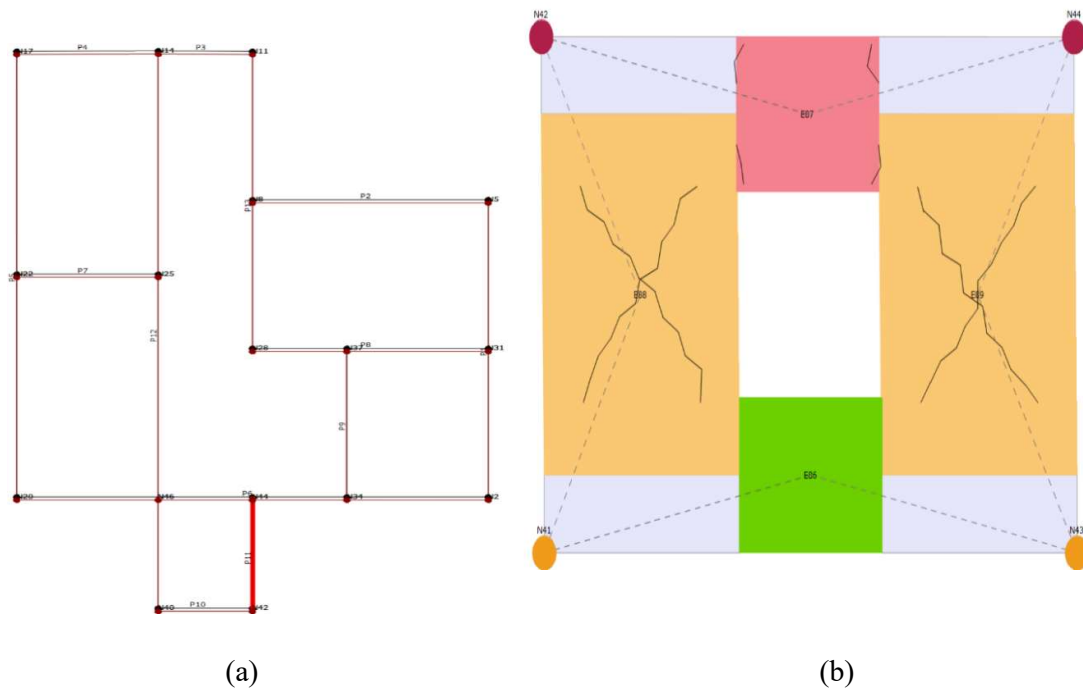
(a) Plan view showing considered wall to check damage (b) Deformed shape of considered wall in EFM
